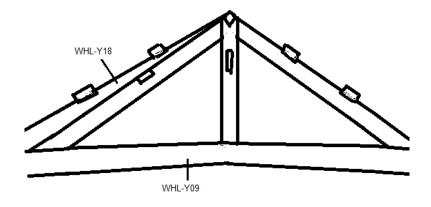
Sketch of truss 4, showing the location of samples WHL-Y09 and WHL-Y18
